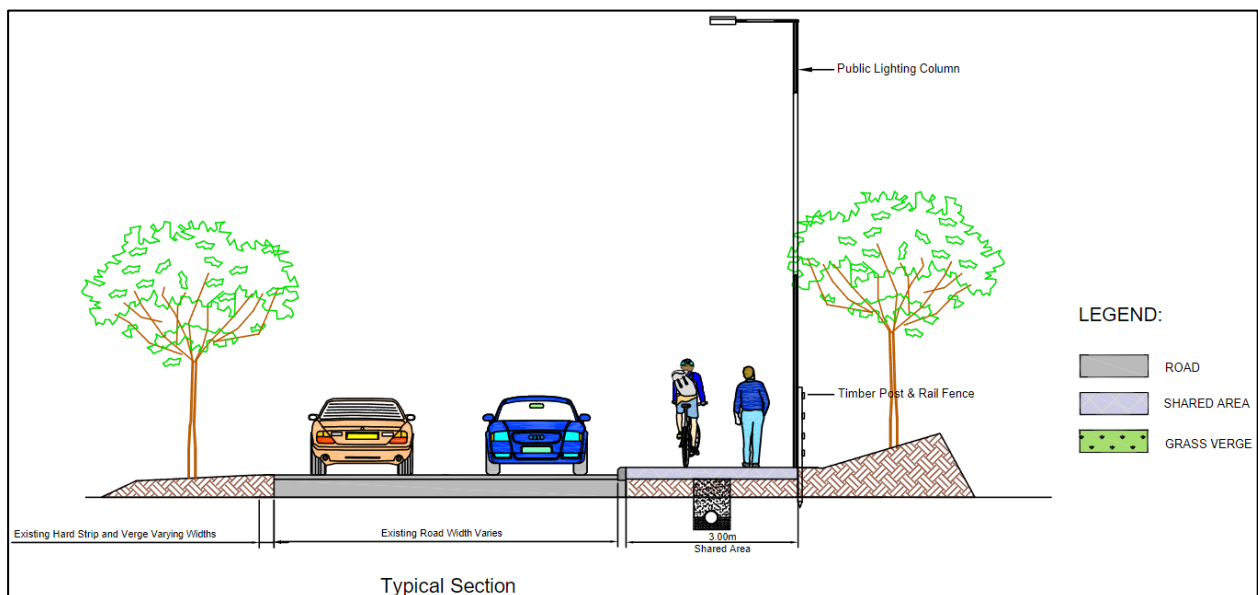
| Rathmullan Road – Proposed Shared Footway / Cycleway – Typical Section
